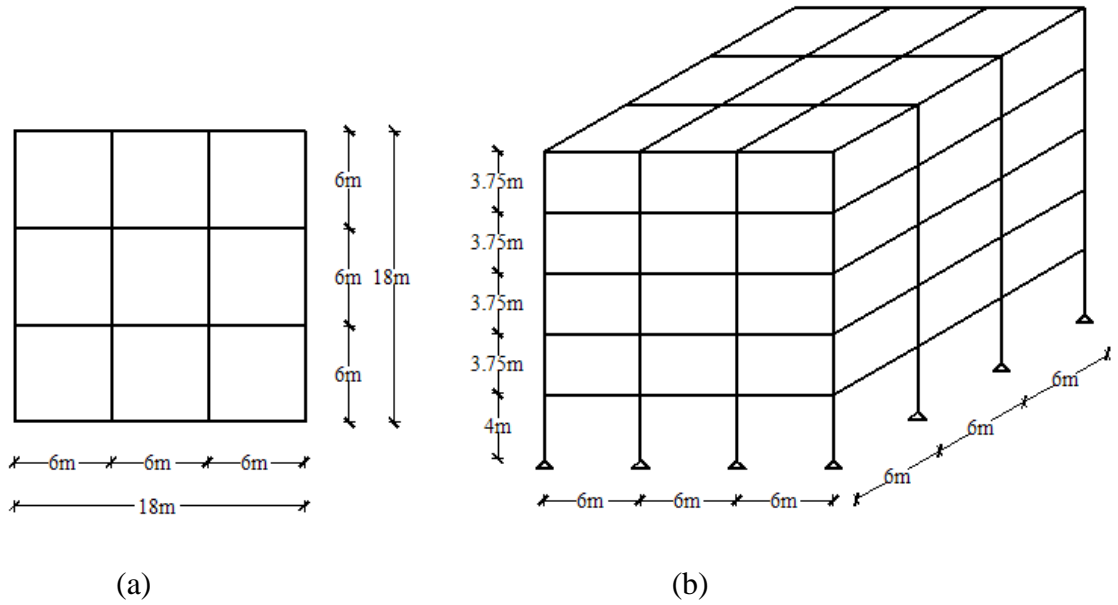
First type of frame model (a) Symmetrical plan, (b) Symmetrical elevation.
